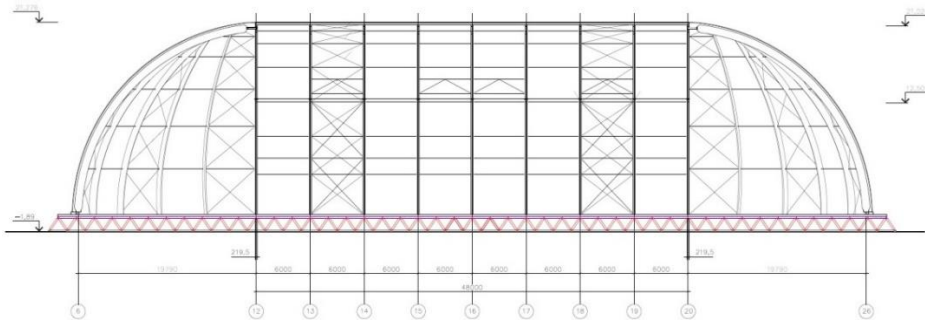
The arrangement scheme of major structures (longitudinal section).
